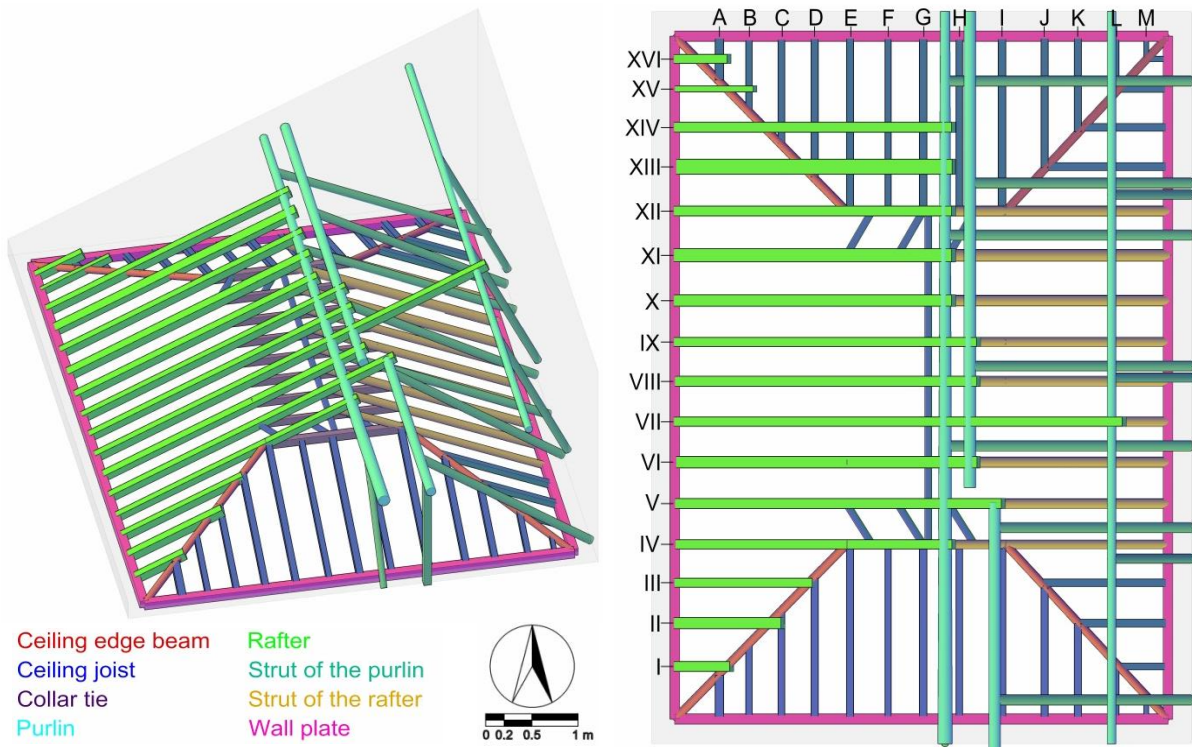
3D modelling and horizontal blueprint of the old roof structure in the dormitory
